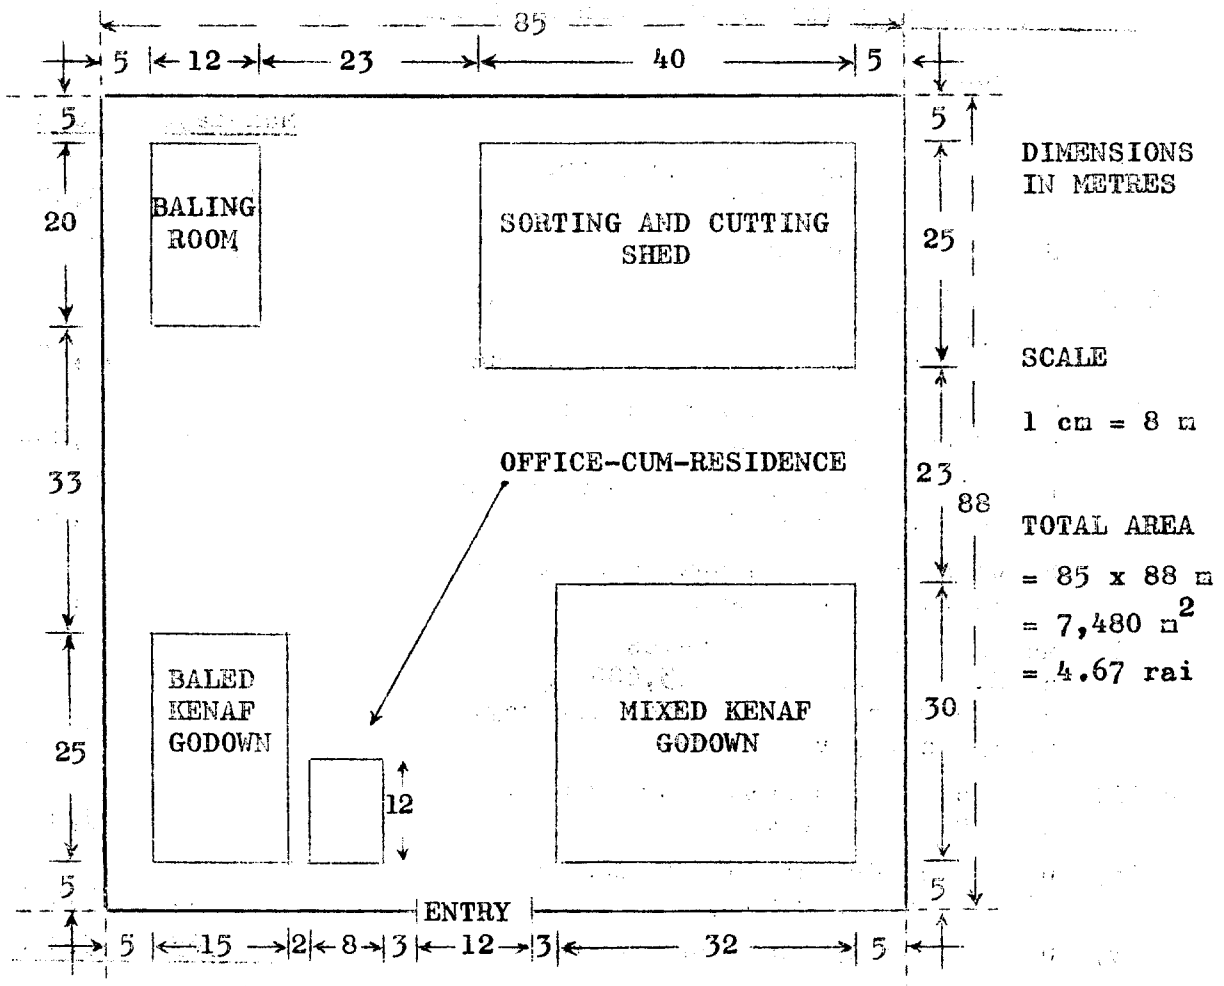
One-press kenaf baling centre for the north-east region of Thailand - ground plan for layout of buildings.
